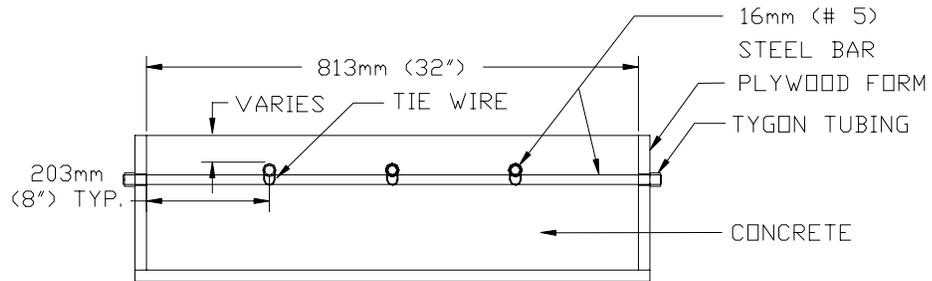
Form and Specimen Diagram for 813 mm (32 in.) Specimen Size
